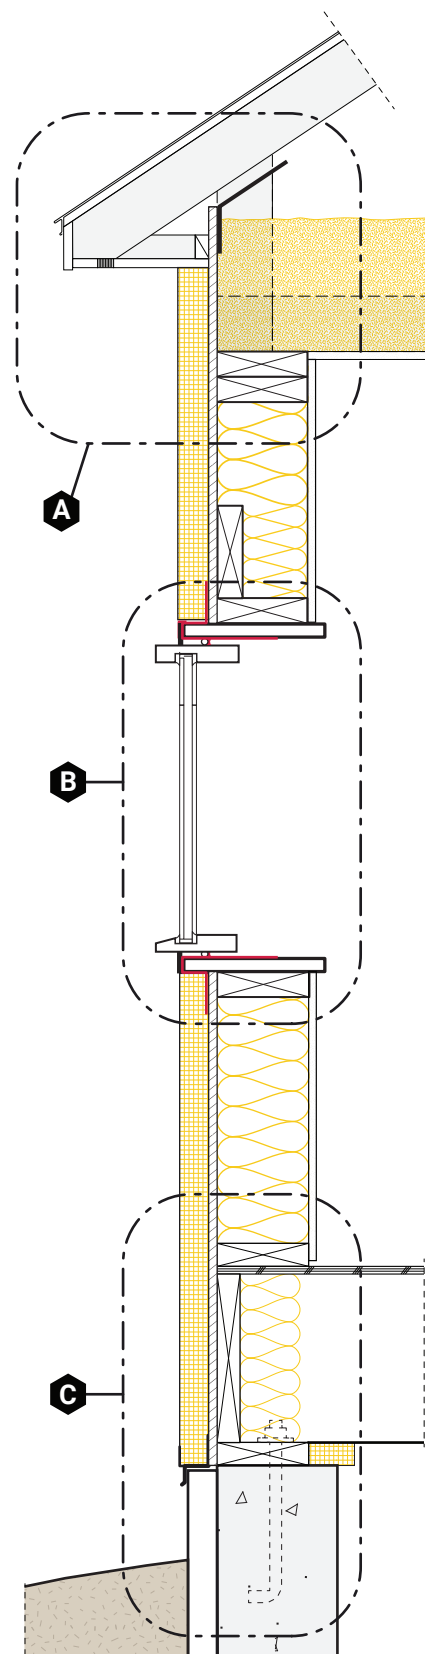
Typical Wall section with TimberBoard continuous exterior insulation
